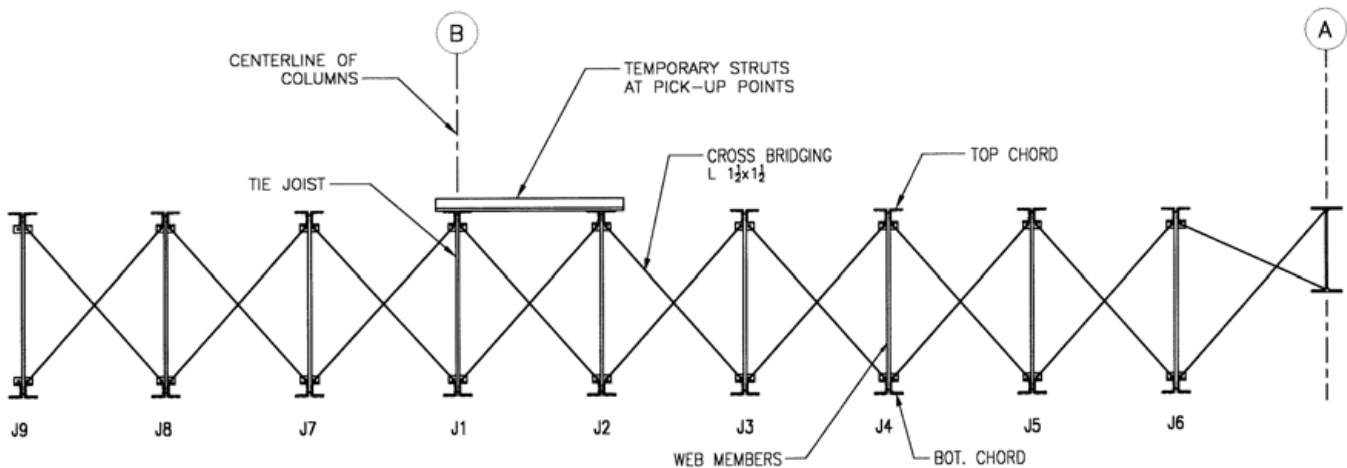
Section through longspan joists in their erected positions. Joist numbers indicate the order of erection.
